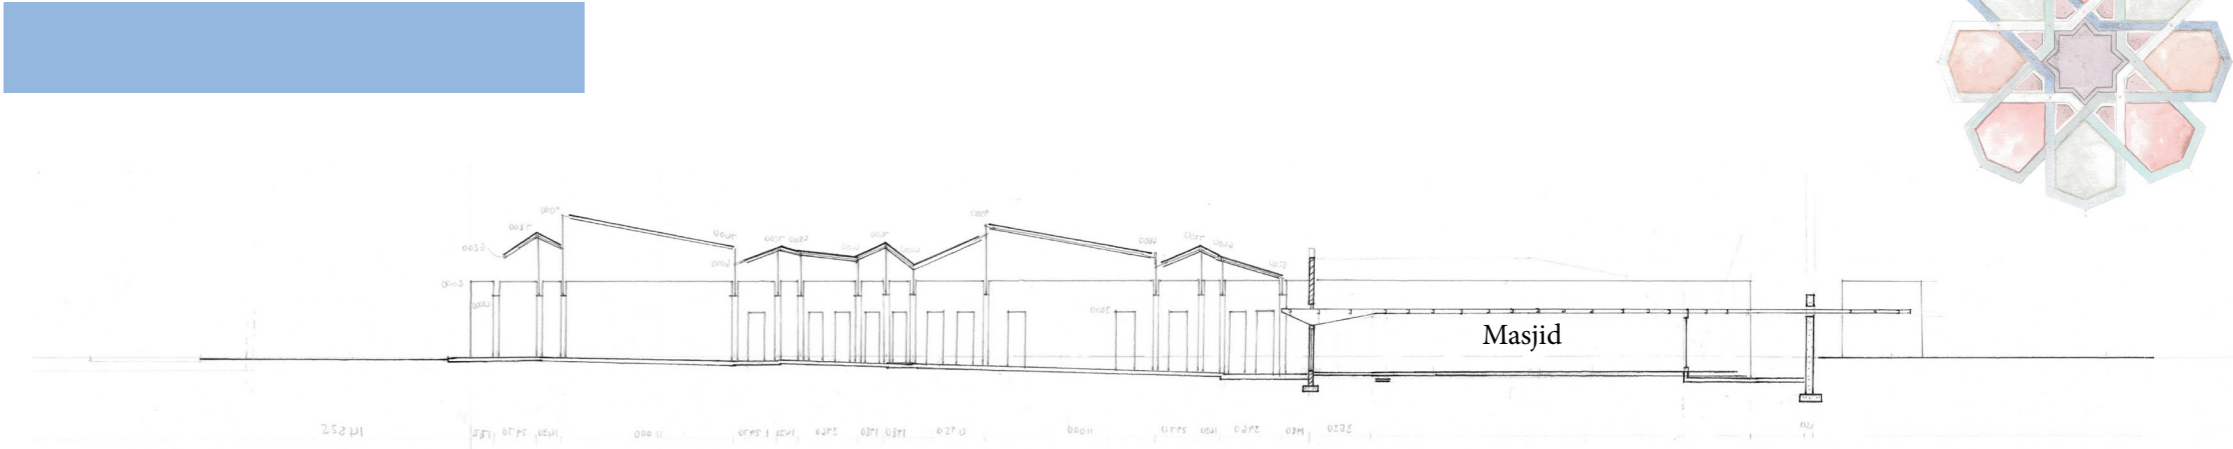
Development 3 long section through the site showing the datum roof (Author, 2021).
